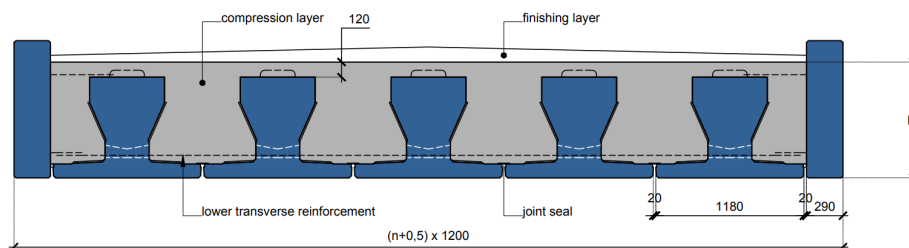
Cross-section of an inverted T-girder system [30]
